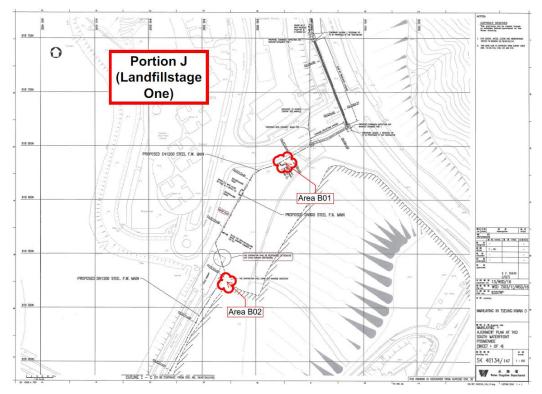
Location Plan – Landfill Stage 1 (Area B01-B02)
